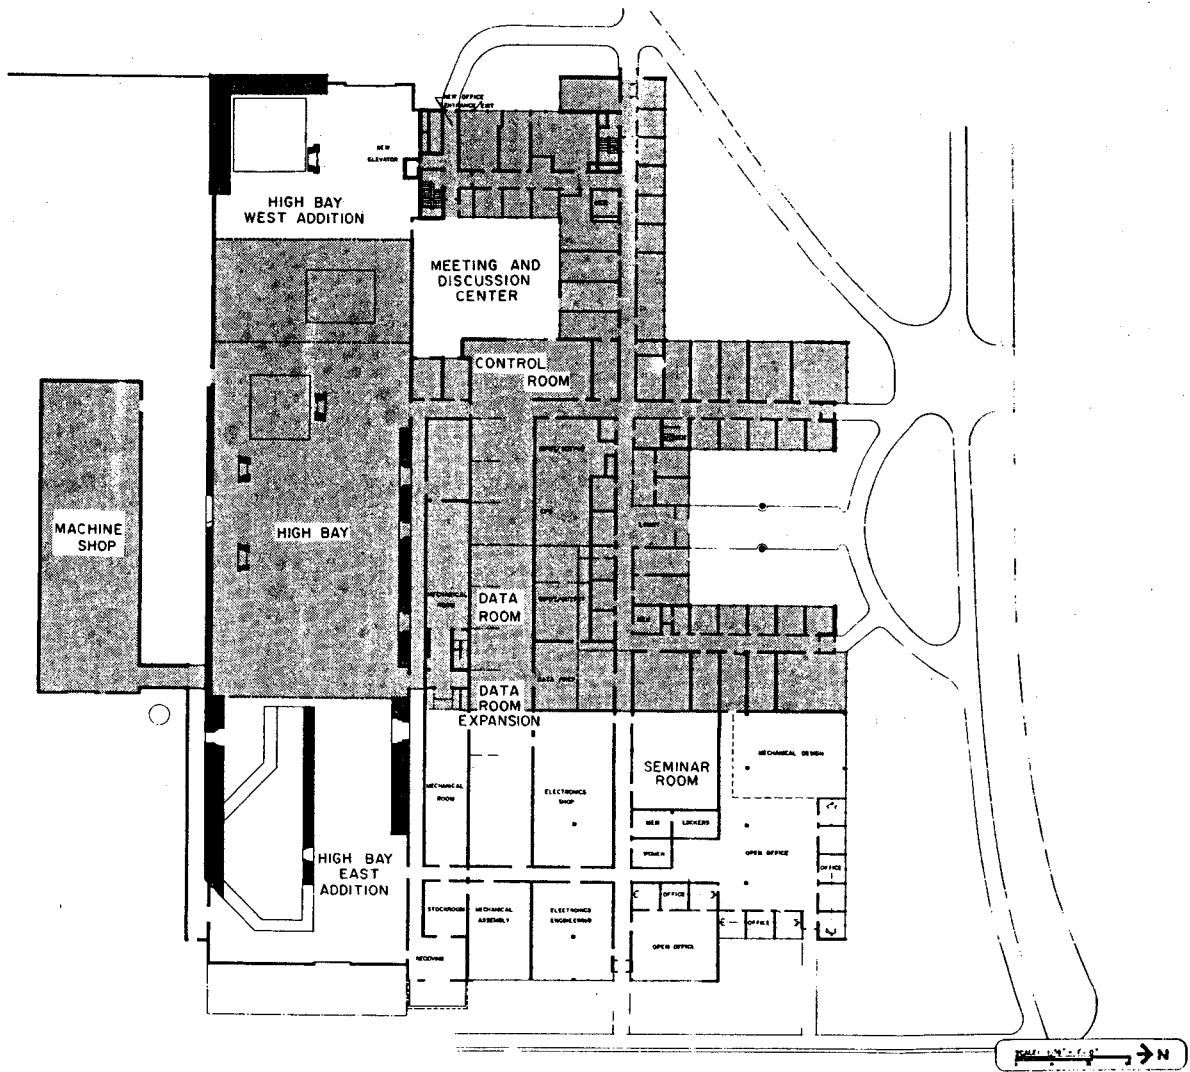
Floor plan of the new building. The original building is shown shaded. Black regions are poured concrete walls for shielding.
